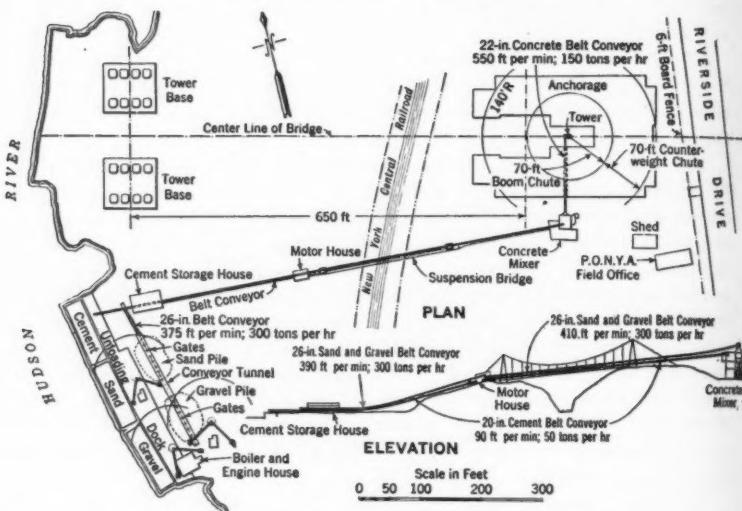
PLANT LAYOUT FOR TRANSPORTING, MIXING, AND PLACING CONCRETE, NEW YORK ANCHORAGE.
